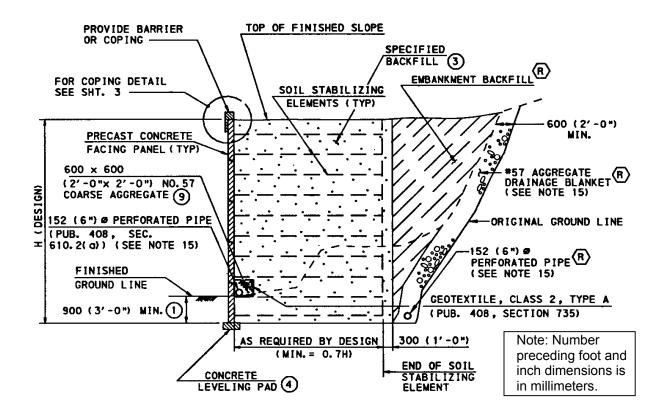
Example drainage blanket detail behind the retained backfill.
